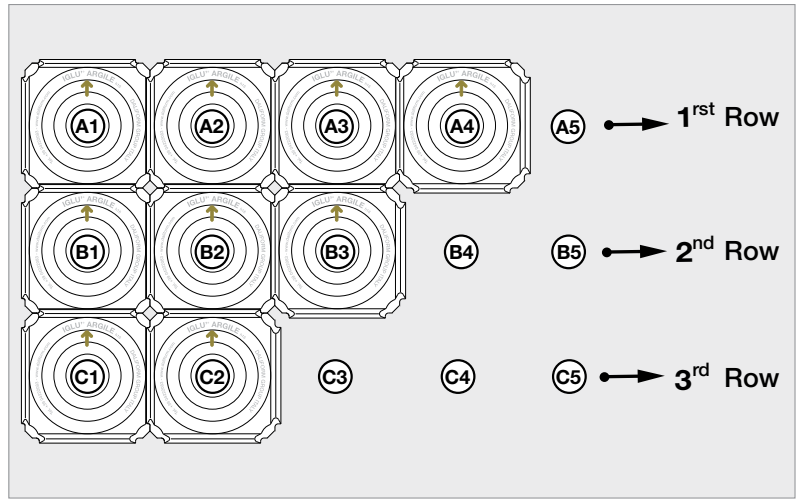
Dry positioning of the first formwork, the arrow is facing the foundation curb.
